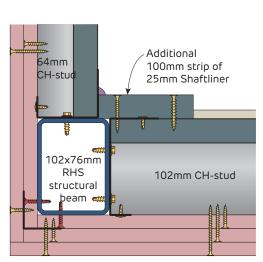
Alternative detail using RHS Beam with 64 and 102mm CH-Studs SHW2 and SHC4 Section
